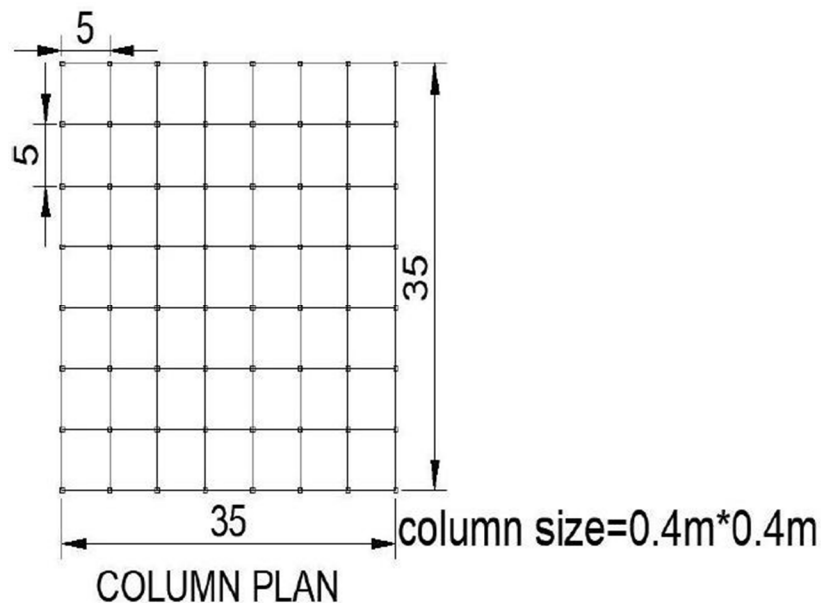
Column plan showing the regular 7x7grid layout; column size=0.4m×0.4m;bay width=5m.
